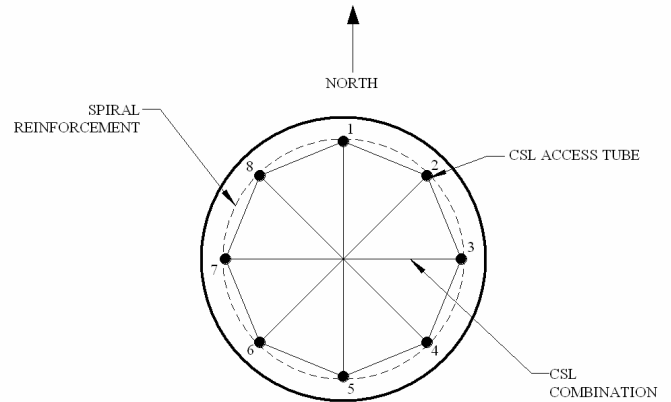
Typical Drilled Shaft Layout – Eight (8) Access Tubes.
